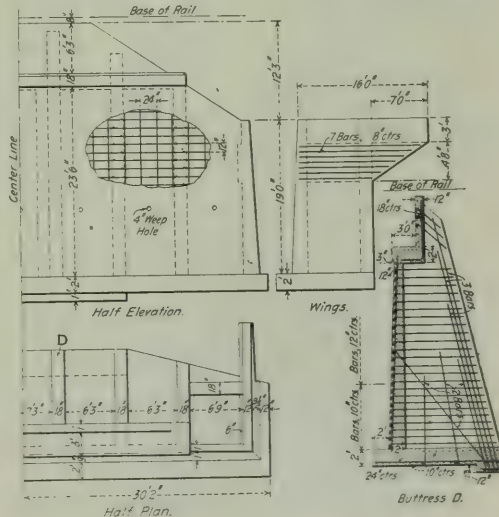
Plan for Reinforced Concrete; West Abutment.
